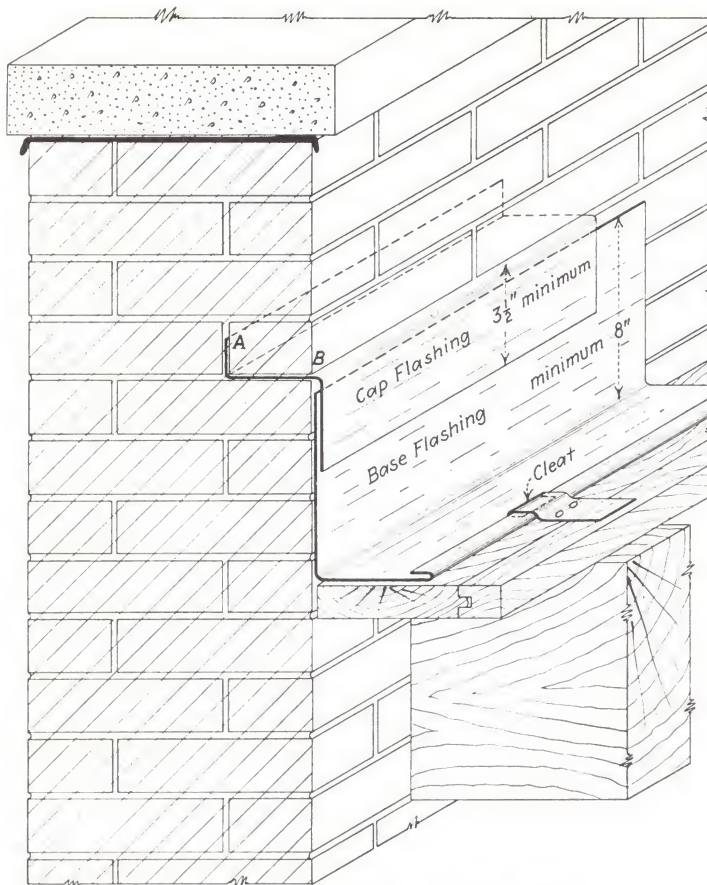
BASE AND CAP FLASHINGS JOINING A BRICK WALL
